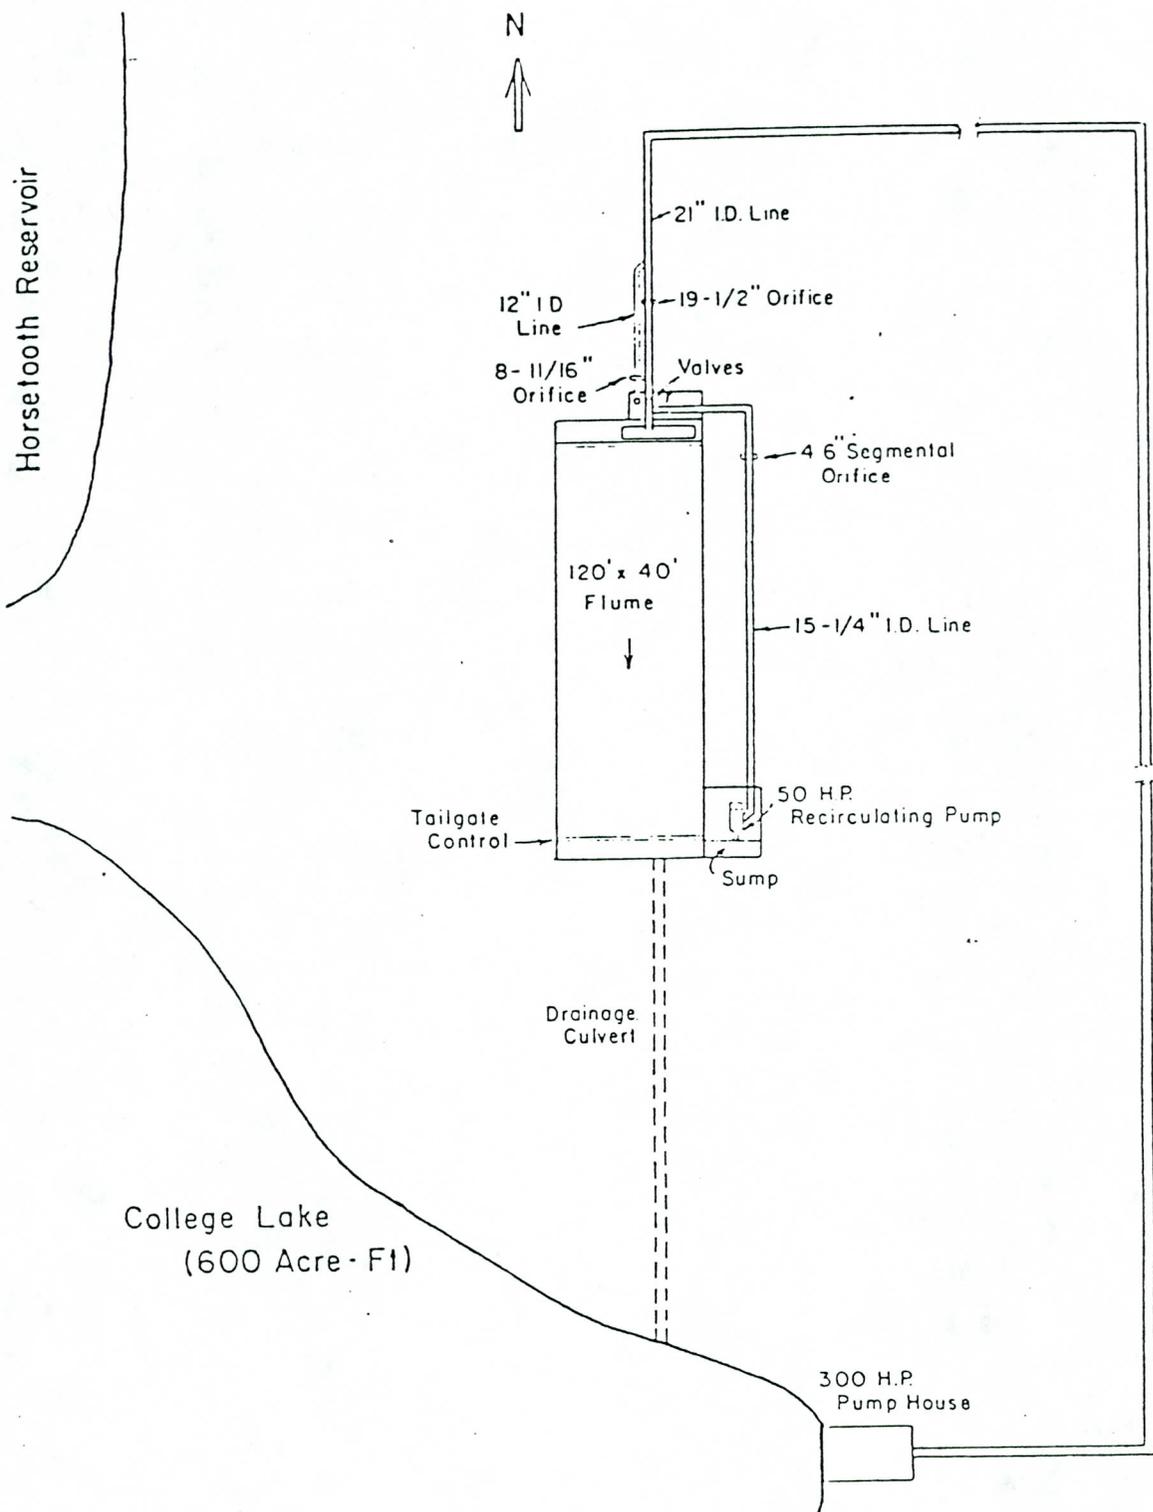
General Layout of the River Mechanics Flume Testing System, Branch Hydraulics Laboratory
